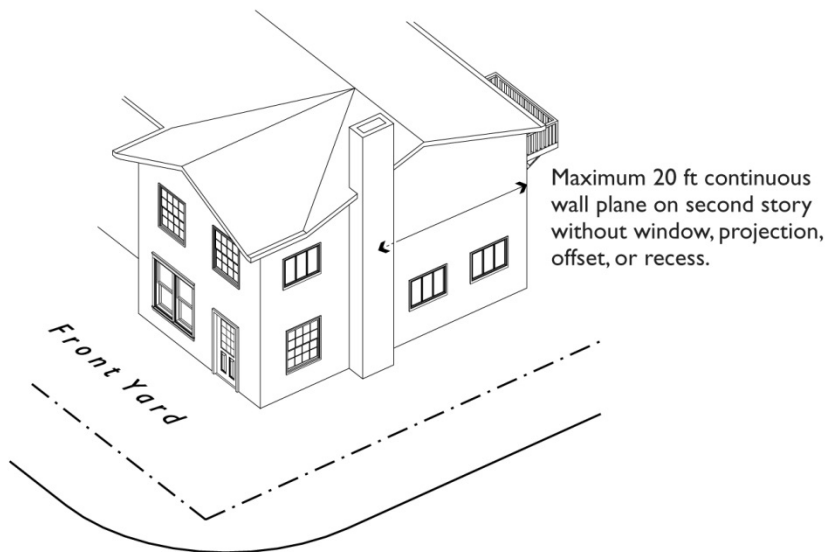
D.1: TWO DWELLINGS ON CORNER LOT
